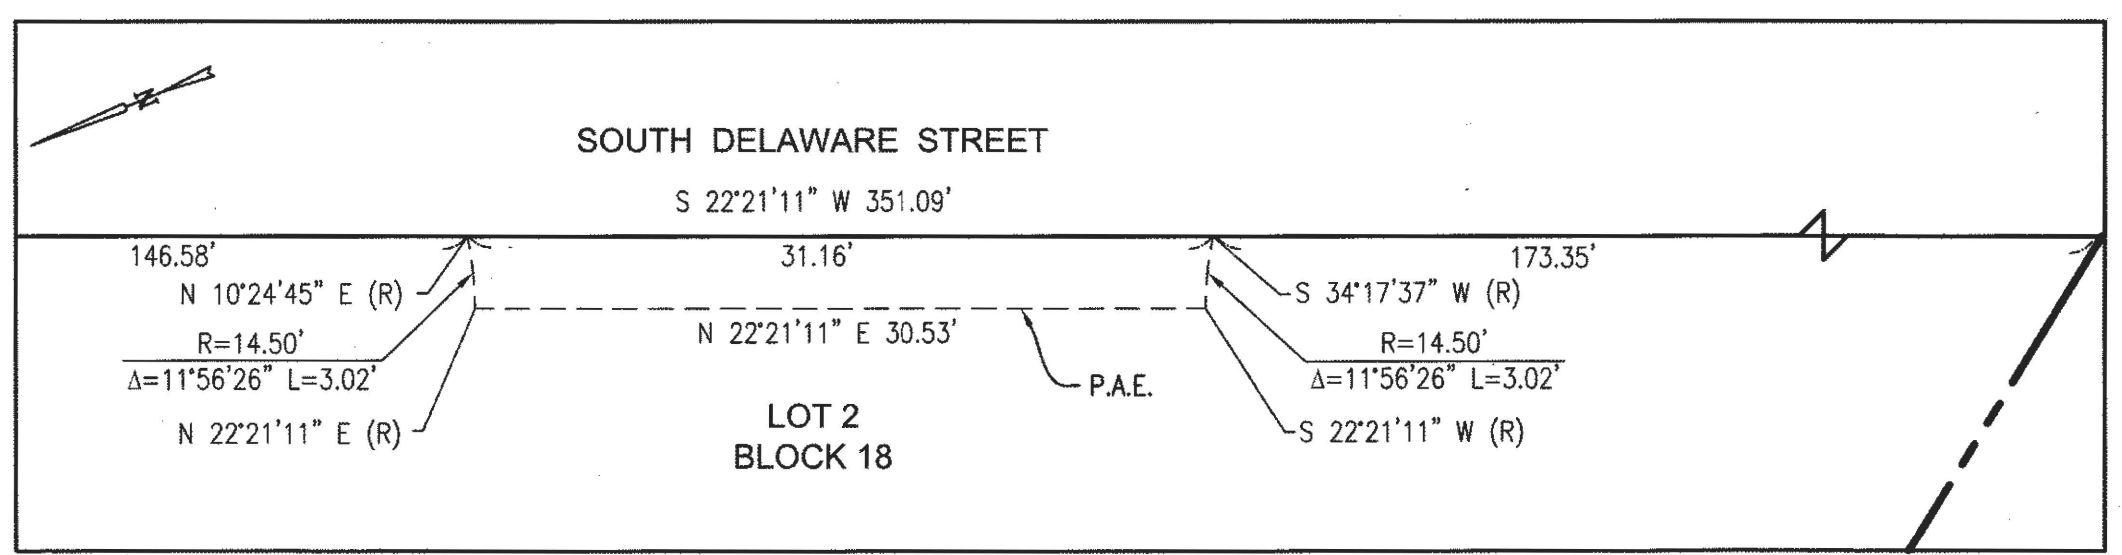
DETAIL 'B' - VERTICAL BUILDING RESERVATION (V.B.R.)
